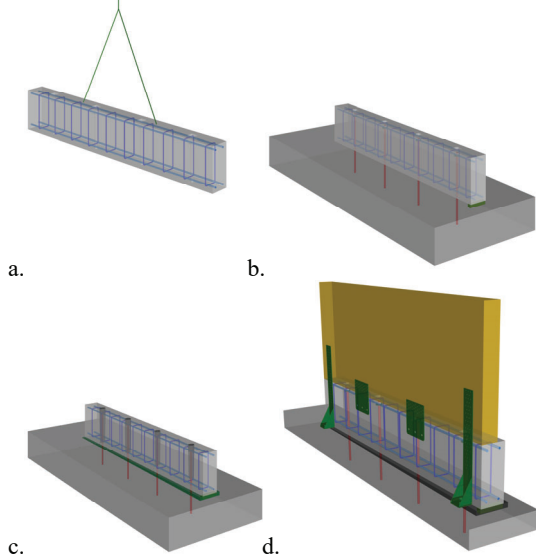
on site construction phases: a) lifting; b) levelling and anchoring; c) filling vertical cones and horizontal gap with repair mortar; d) connecting timber wall to the prefabricated system
